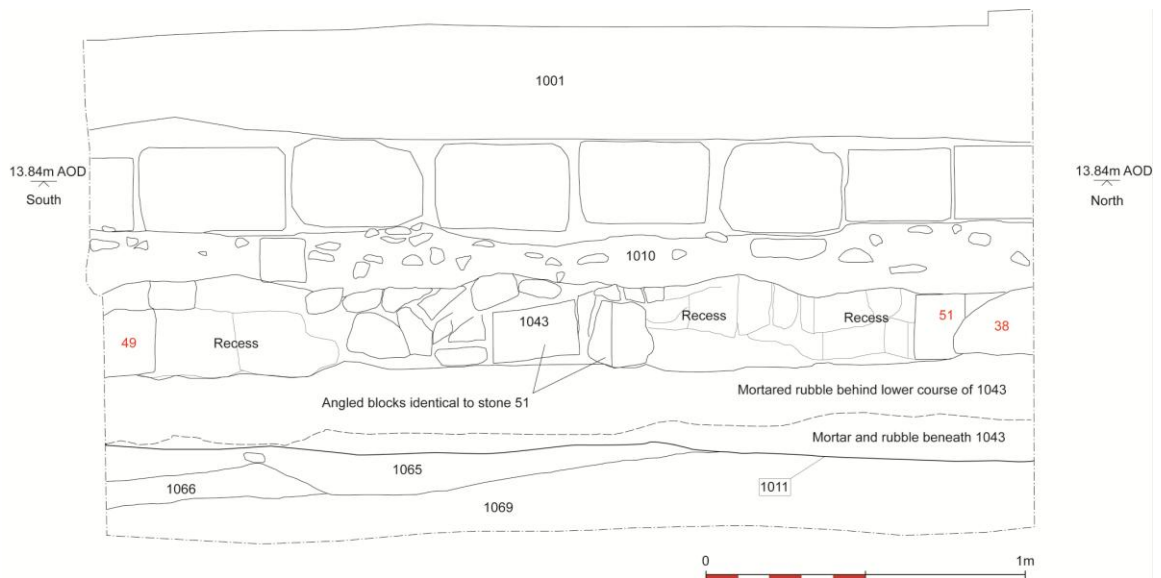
East facing elevation of west wall foundation, after stone removal, with obscured stones in upper course shown numbered in red
